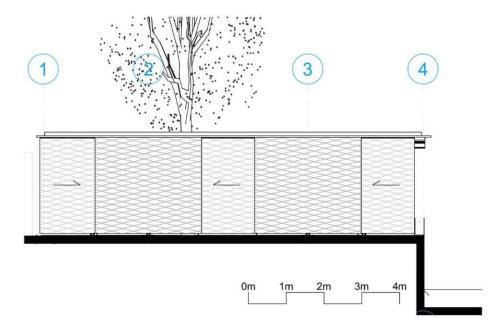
Elevation West M1:100. The Paneling is made of expanded metal. Three sliding panels provide access to the shed
